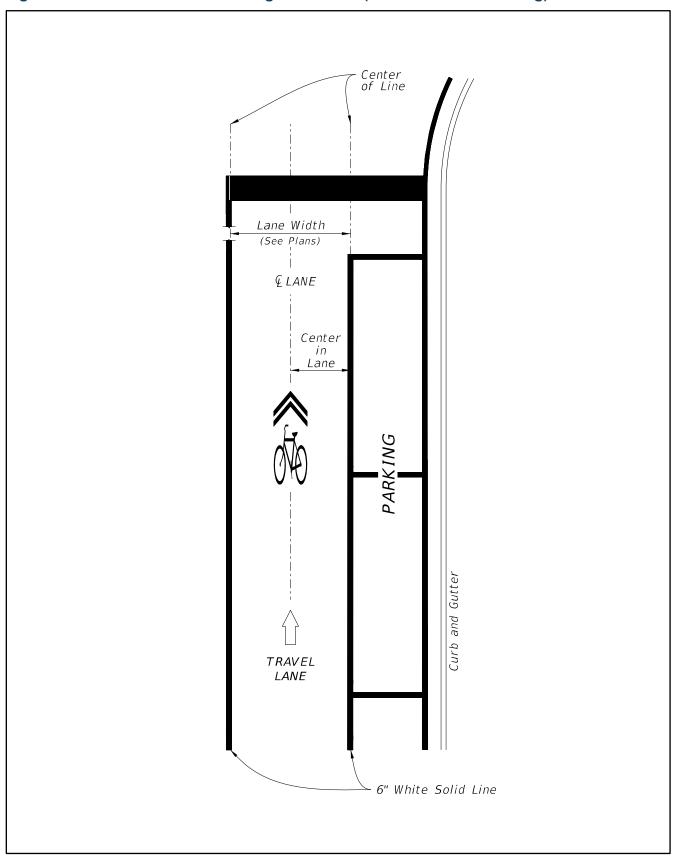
Shared Lane Marking Placement (With On-Street Parking)
